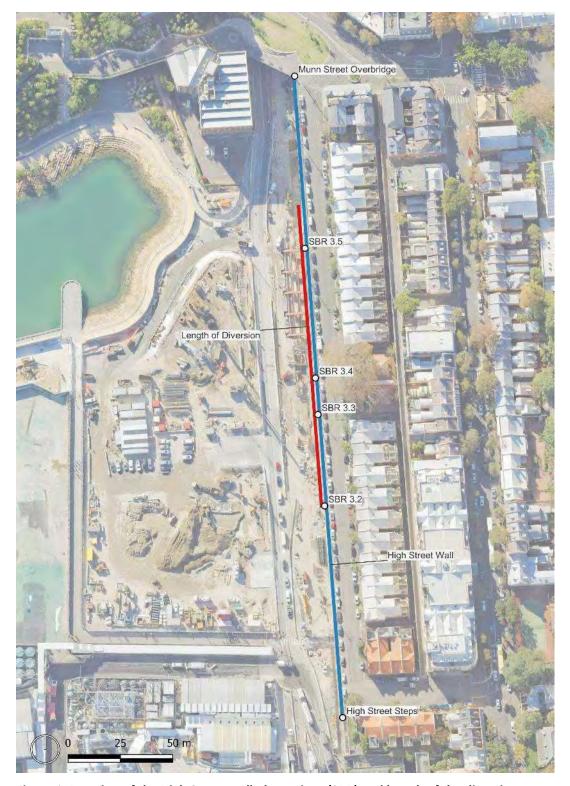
Location of the High Street wall, downpipes (SBR) and length of the diversion.
